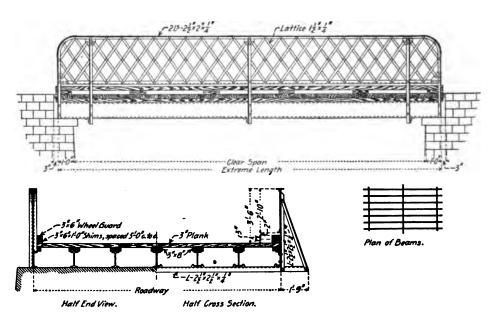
BEAM BRIDGE. AMERICAN BRIDGE COMPANY.
